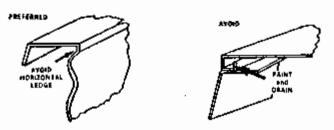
and 36b. CORRECT & INCORRECT STRUCTURAL DESIGN
